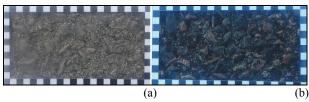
Pavement at the test site Rokinge: (a) dry conditions; (b) wet conditions.
